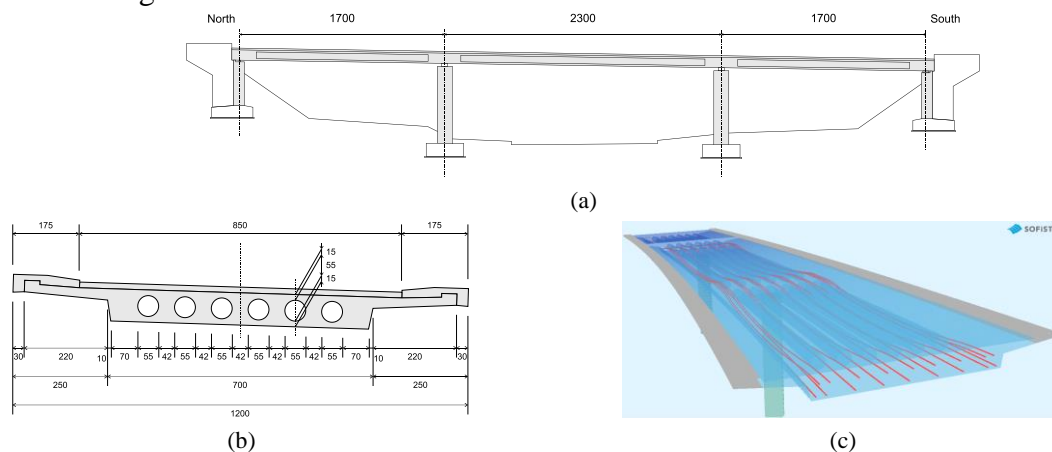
Monitored bridge: (a) Longitudinal view of the bridge (dimensions in meters); (b) Bridge's cross-section (dimensions in centimeters); (c) FE model in SOFiSTiK: main deck's cross-section and prestressing tendons.
